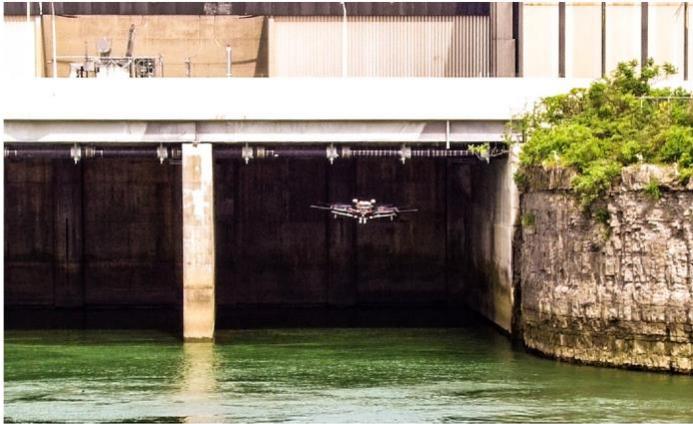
sUAS pipe inspection in a difficult access location, here the distance from pilot to pipe is 1,000 feet
